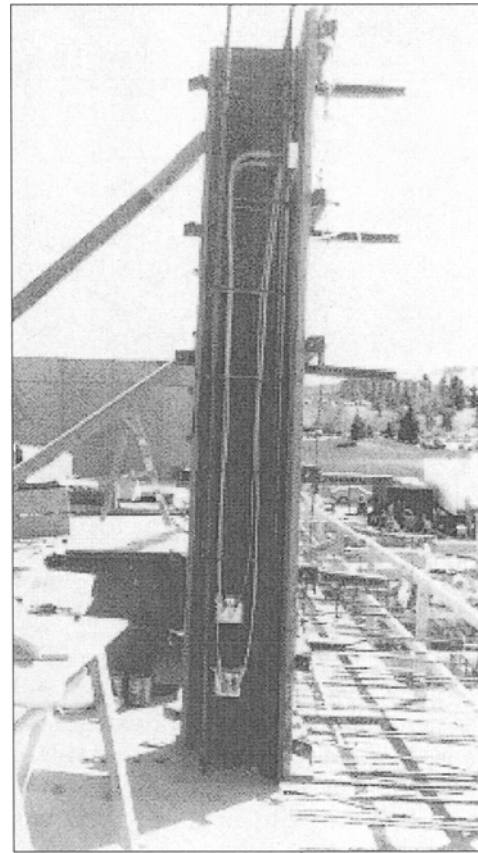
Elevation view of a column with a completed fiber optic installation.
